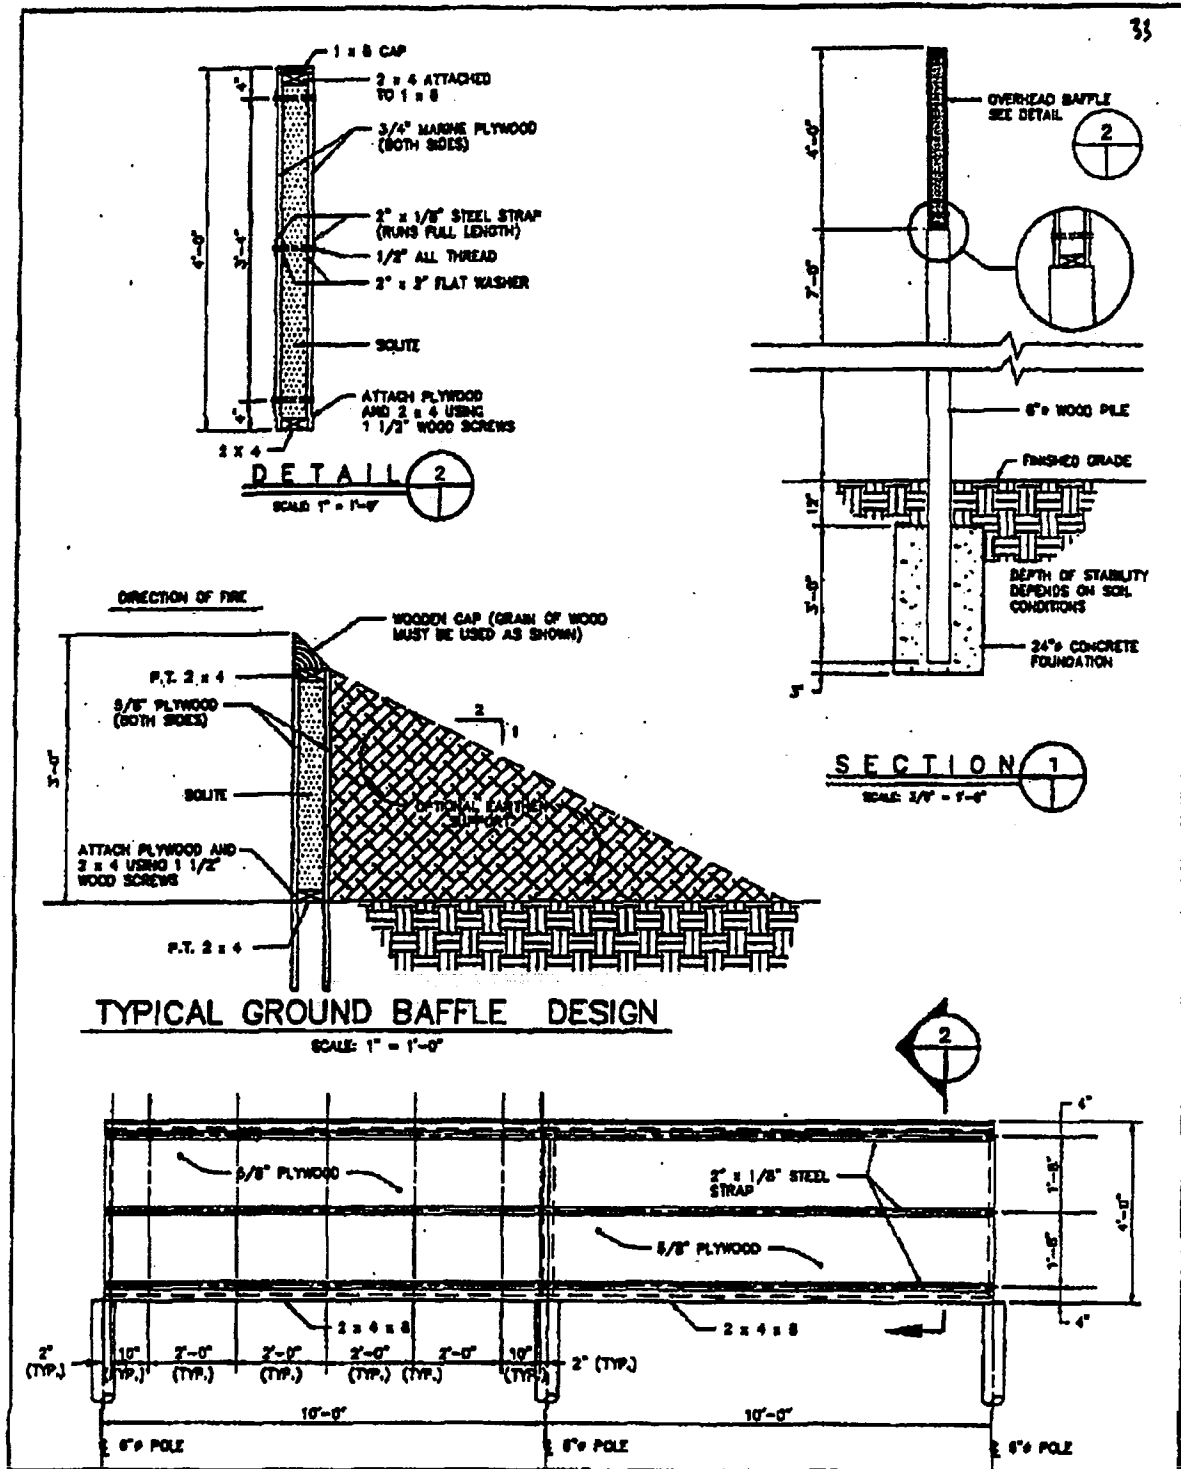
Typical Overhead and Ground Baffles Details and Sections
